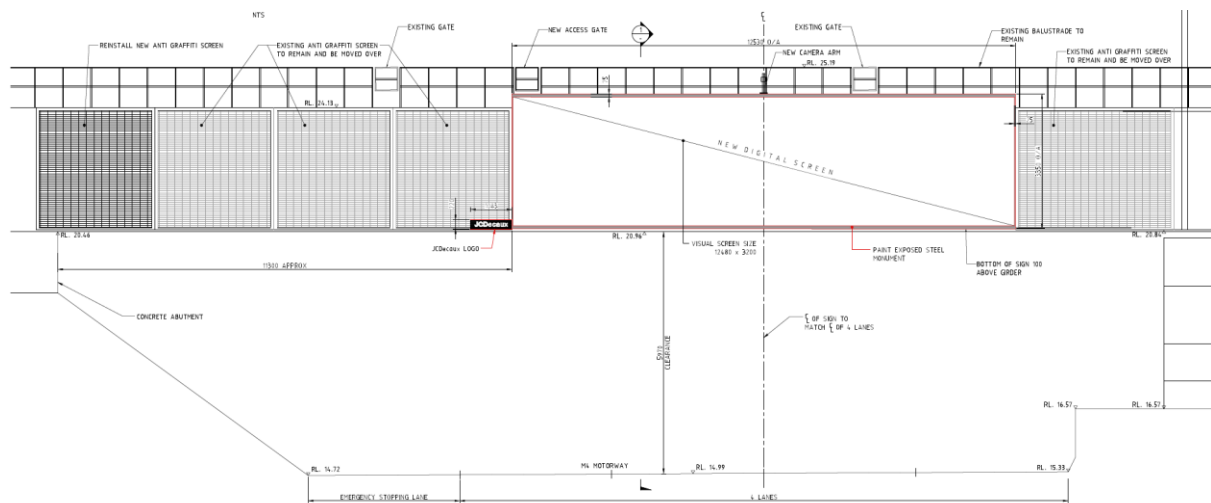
| Digital sign western elevation (Source: Architectural plan)
